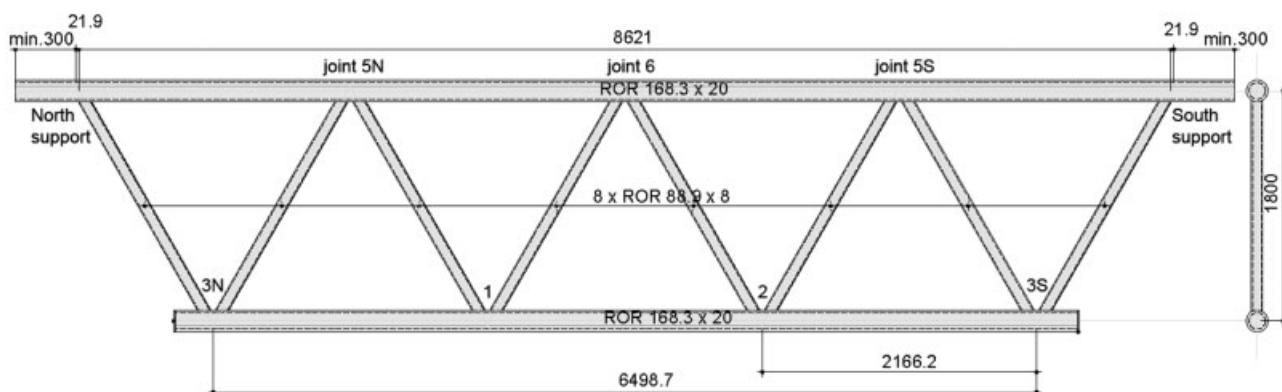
Elevation of a truss beam with dimensions and joint numbering
